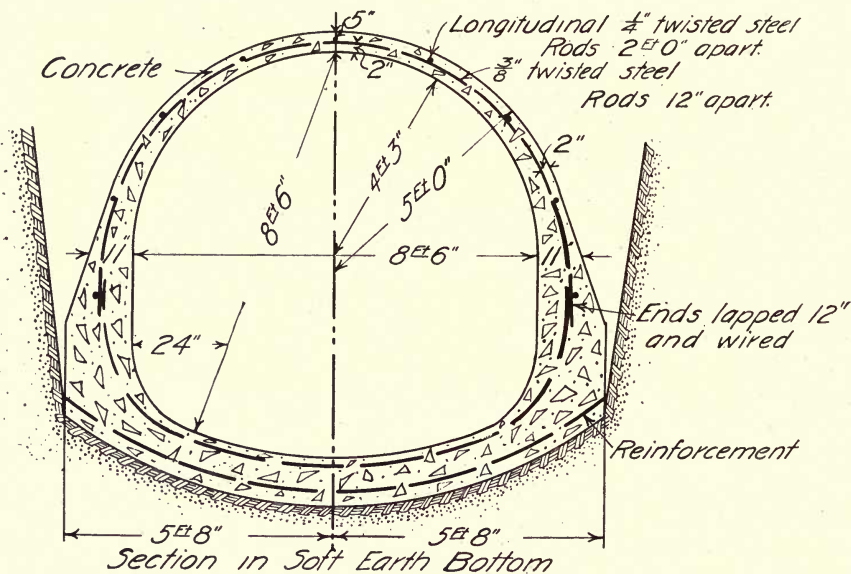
TYPICAL CROSS SECTION, JERSEY CITY CONDUIT;
